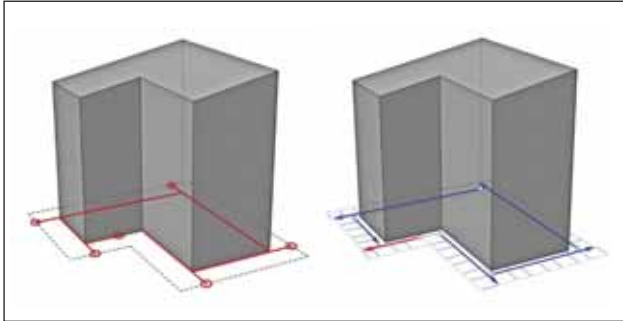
Testing corner configuration in building footprint and resulting scaffolding layout lines
